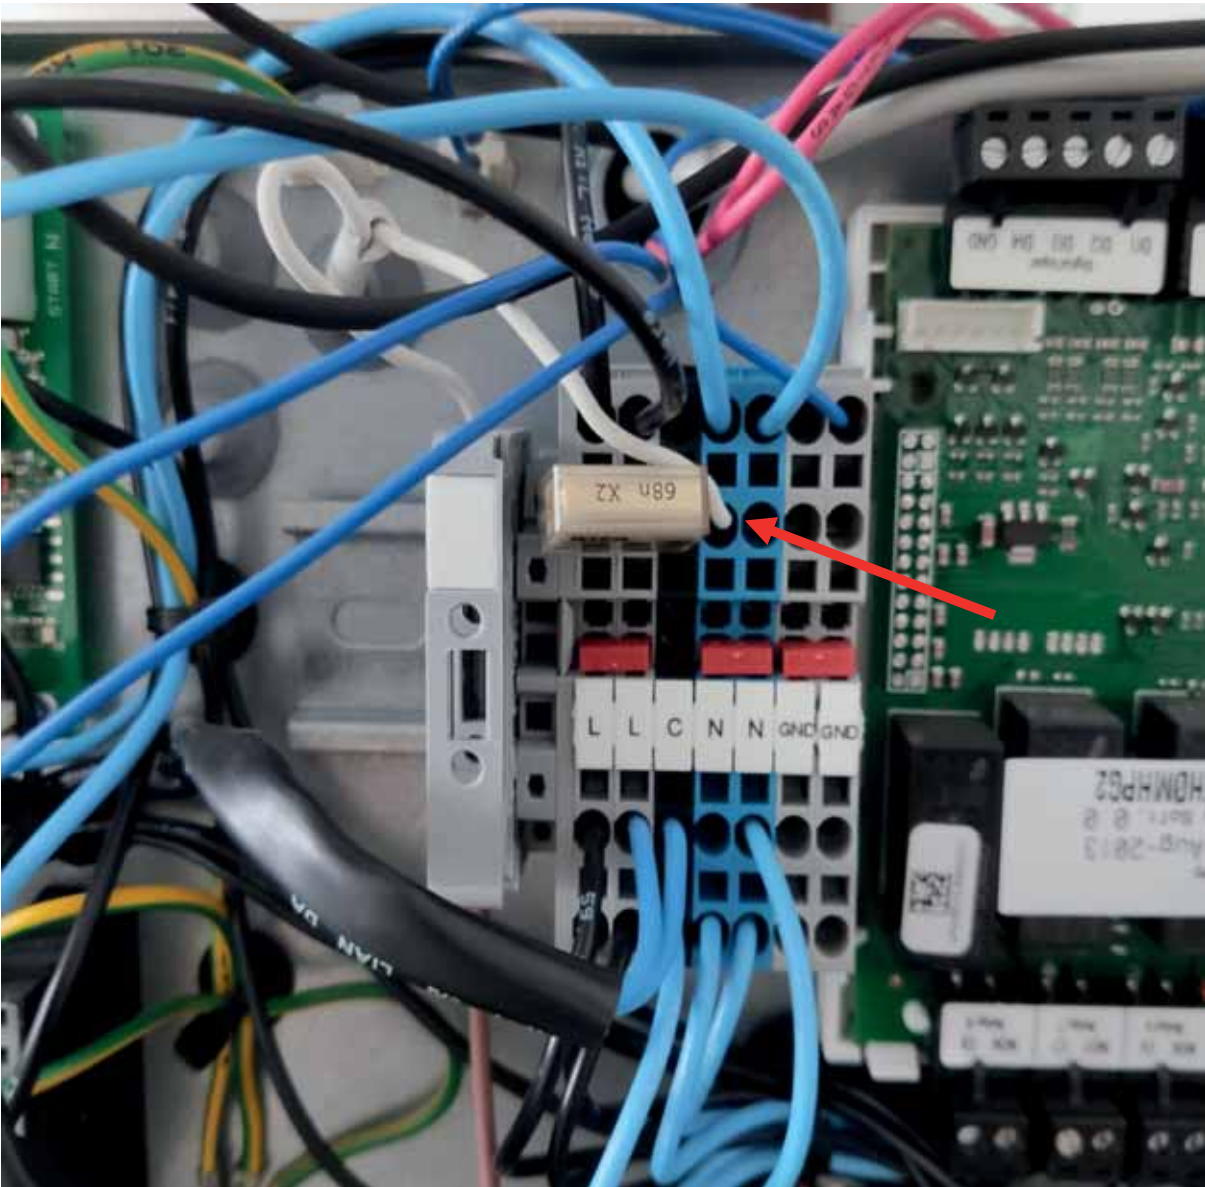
Heating cable wiring to the terminal board – CTC 400 series heat pump
